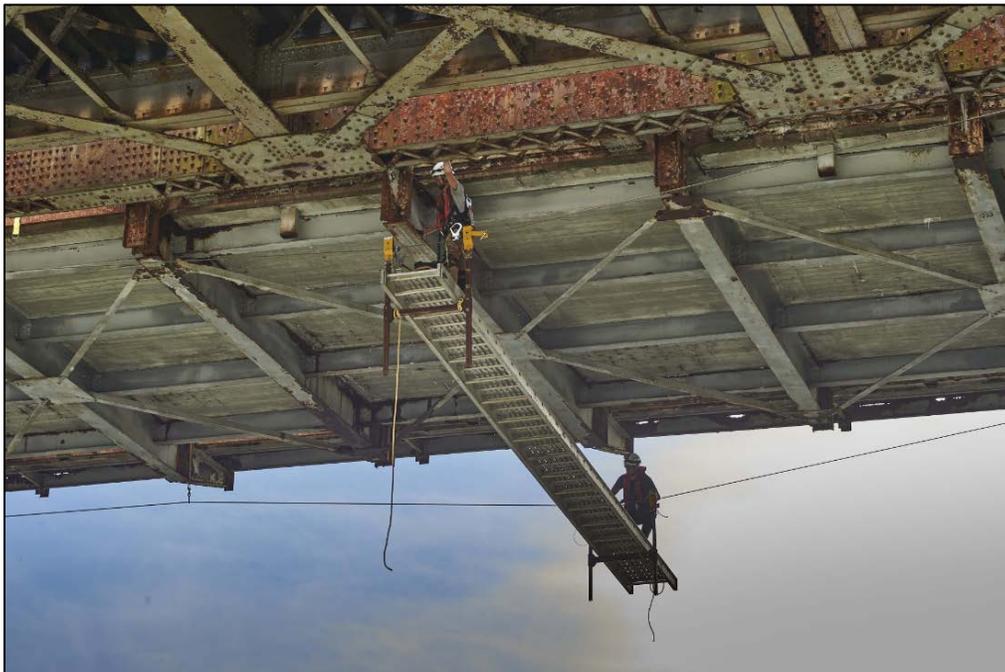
Below-deck inspection of truss from a pickboard
